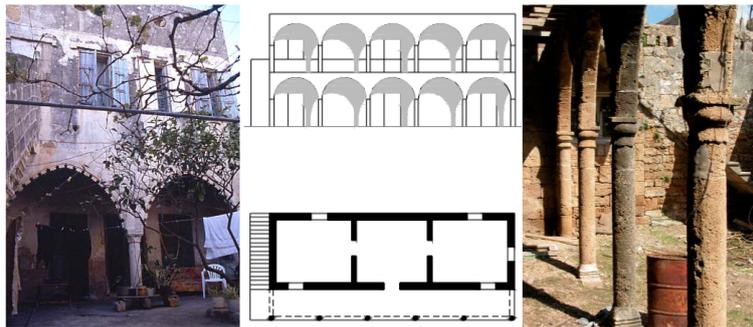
Rural house with Riwaq: exterior view (left), plan and elevation (center), and view from the Riwaq (right). Source: CORPUS Project.
